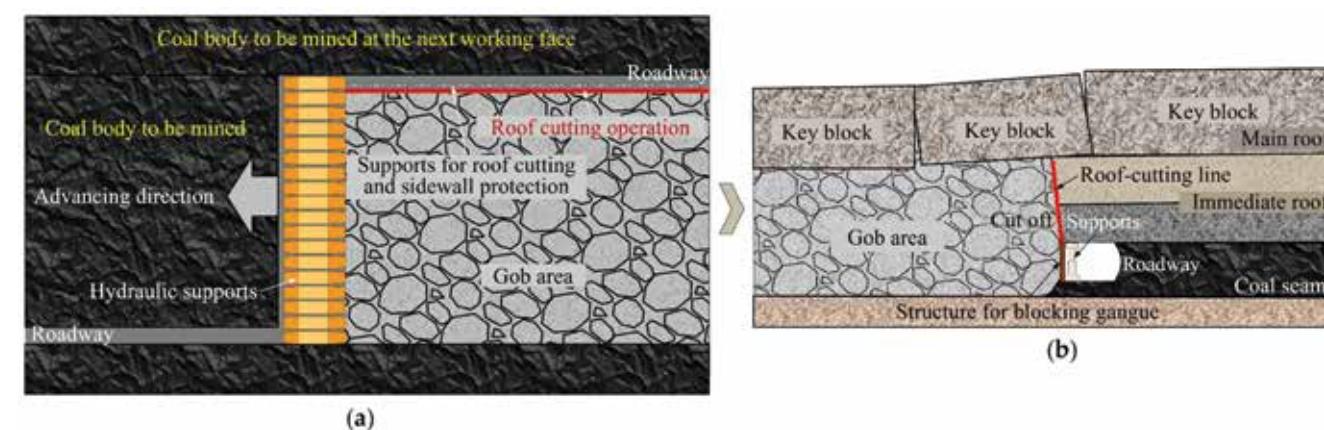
Cutting roof and retaining roadway technology in the "N00" construction method. (a) Plane diagram of "N00" construction method (b) The diagram of the retained roadway.
